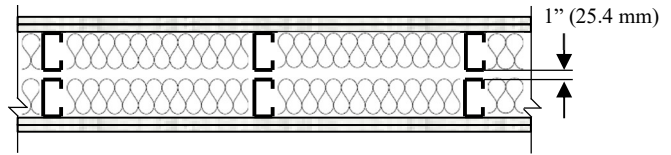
Configuration of the base wall assembly with two layers of fire rated gypsum board directly attached to both sides of the wall.
